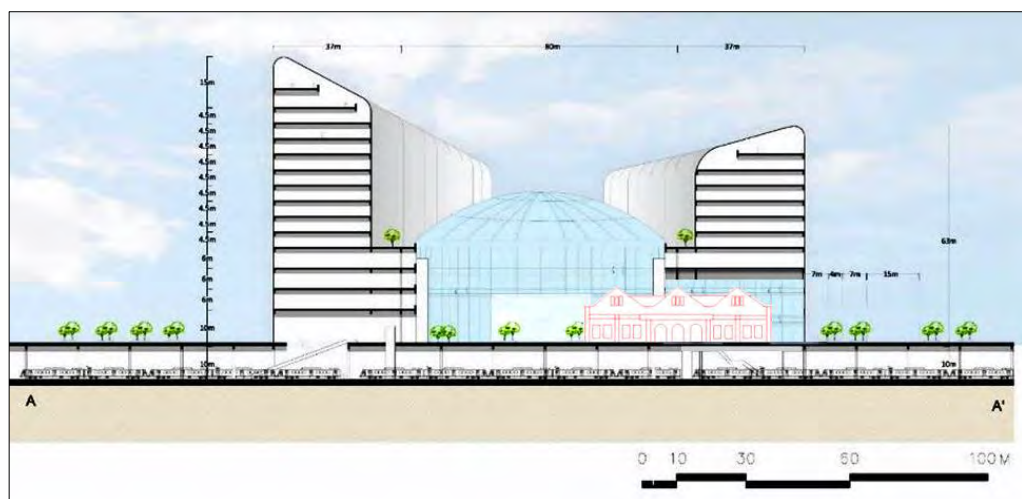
Architecture Drawing of New Central Station (Section-1)
